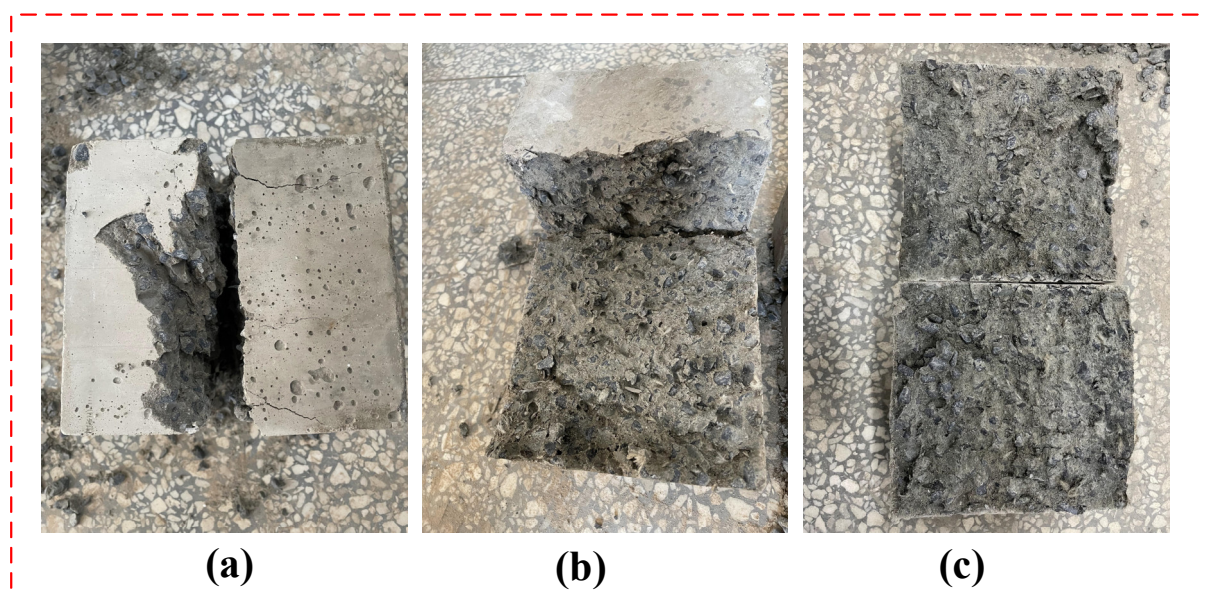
Failure modes in splitting tensile tests: (a) Plain concrete; (b) Rubber concrete; (c) PVA rubber/concrete.
